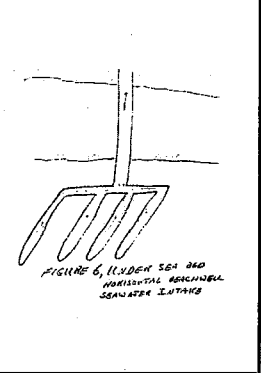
, SLOTTED SEA BED HORIZONTAL BERM WALL SEAWATER INTAKE
